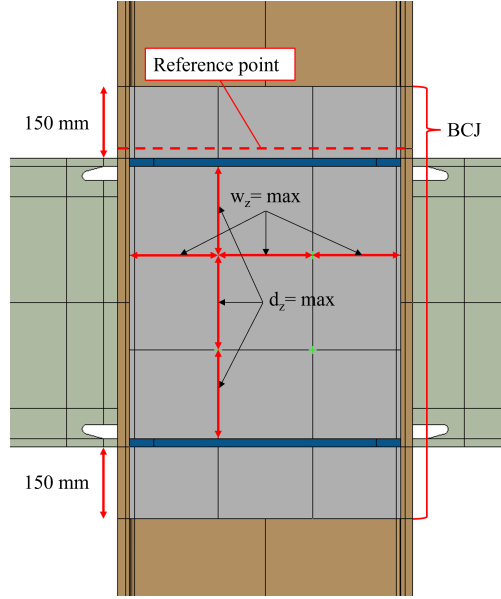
Beam-column joint detail; beam (green), columns (brown), continuity plates (blue). Beam column joint (BCJ). Doubler plates overhang above and below beam flanges (grey) and positioning of the plug-welds. Rigid body-constraint between the reference point and cross-section of the column (red dashed line)
